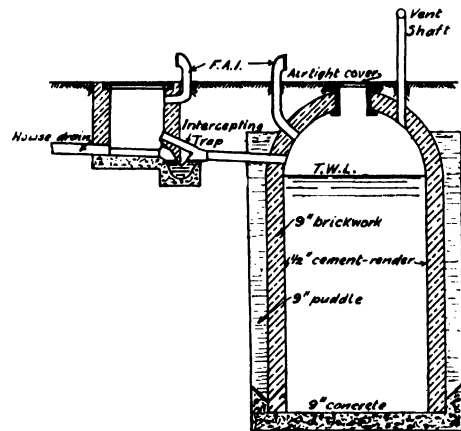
CESSPOOL AND DRAIN CONNECTIONS
